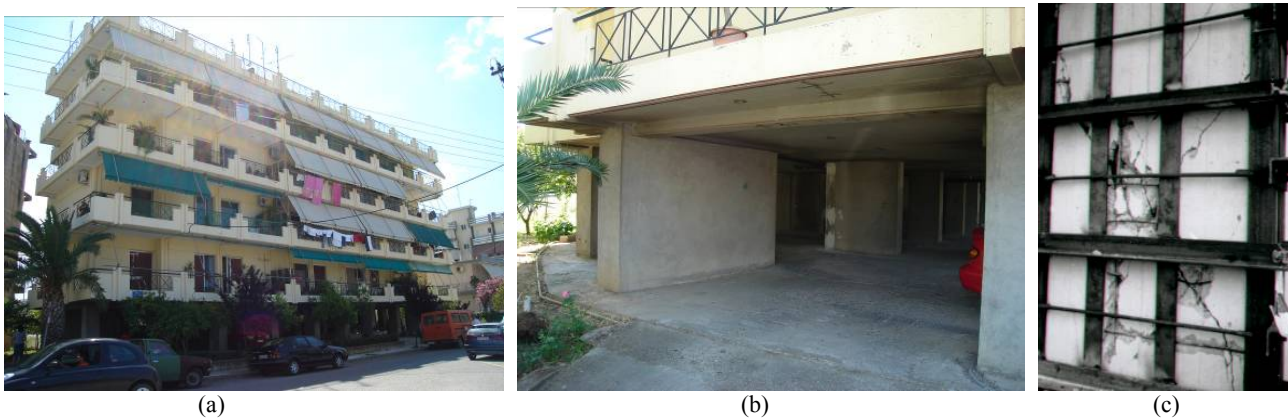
(a) A 5-story structure damaged at the “soft story” ground floor as it stands today; (b) The damaged vertical elements of the “soft story” after being repaired; (c) A typical “soft story” shear wall damage being temporarily strengthened.
